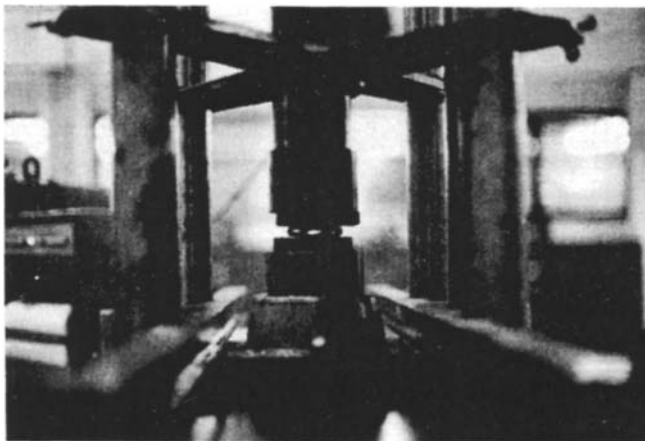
C1-3 at the end of the test, before removing from the universal testing machine.
